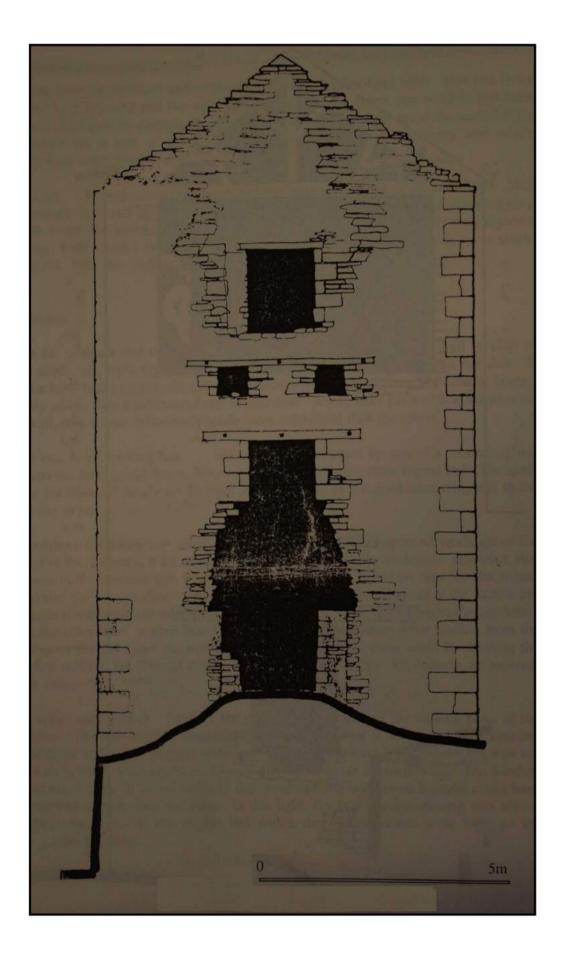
Cornish engine house; east elevation, Snailbeach, after Morriss 1997
